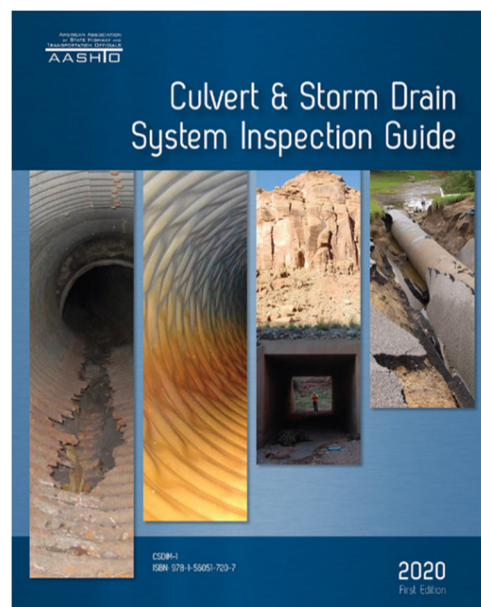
AASHTO Culvert and Storm Drain System Inspection Guide (2020)
